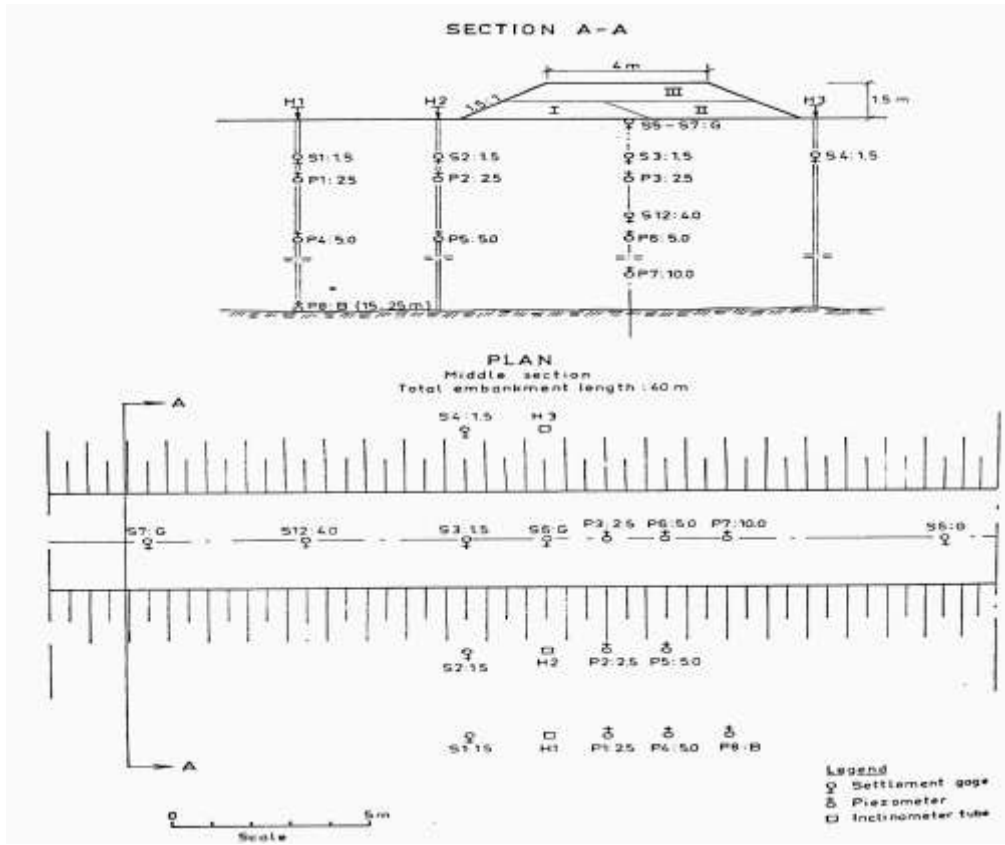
Plan and section of Skä Edbey embankment showing gage locations and depth below ground surface in meters) (from Holtz, 1972).
